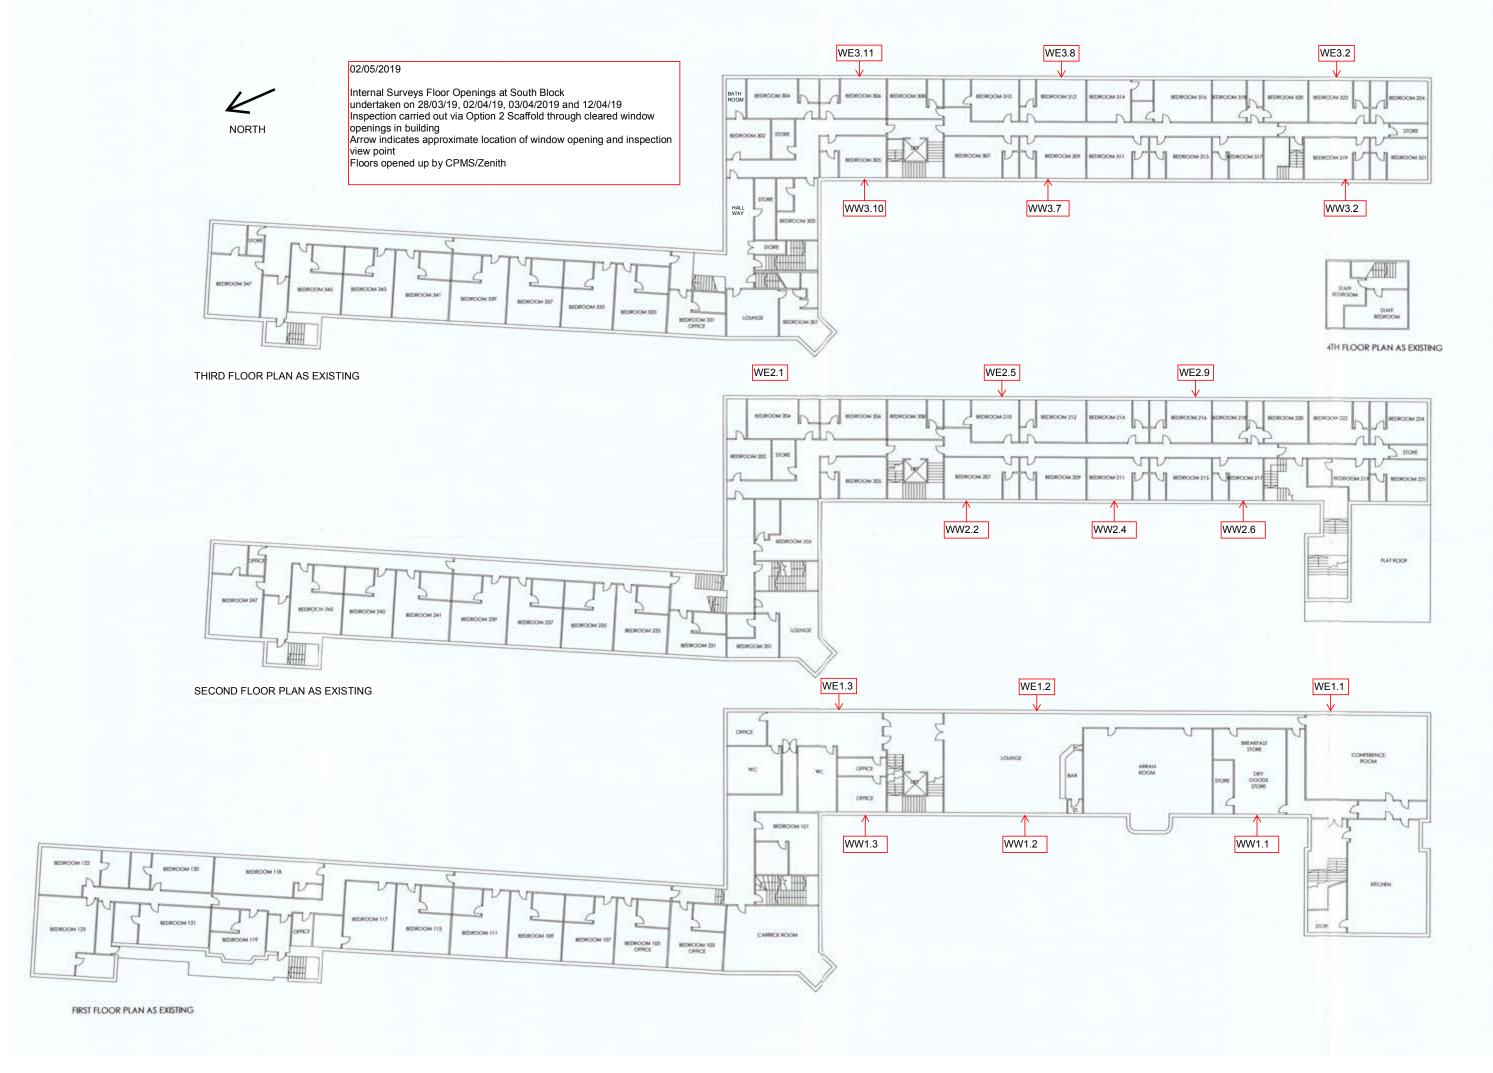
Plan R4 of Station Hotel Building showing Defect/Observation Locations
